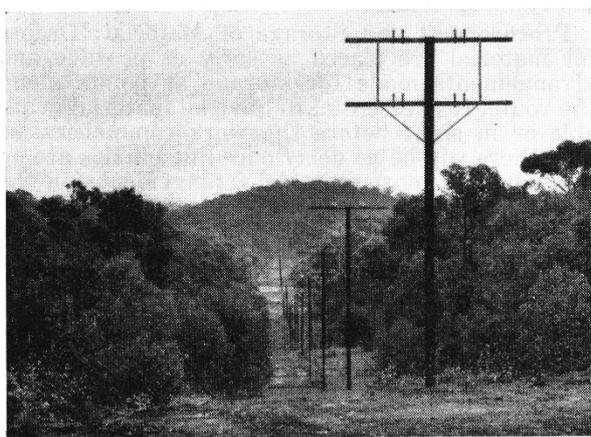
Seymour-Bendigo route, showing extent of clearing.
